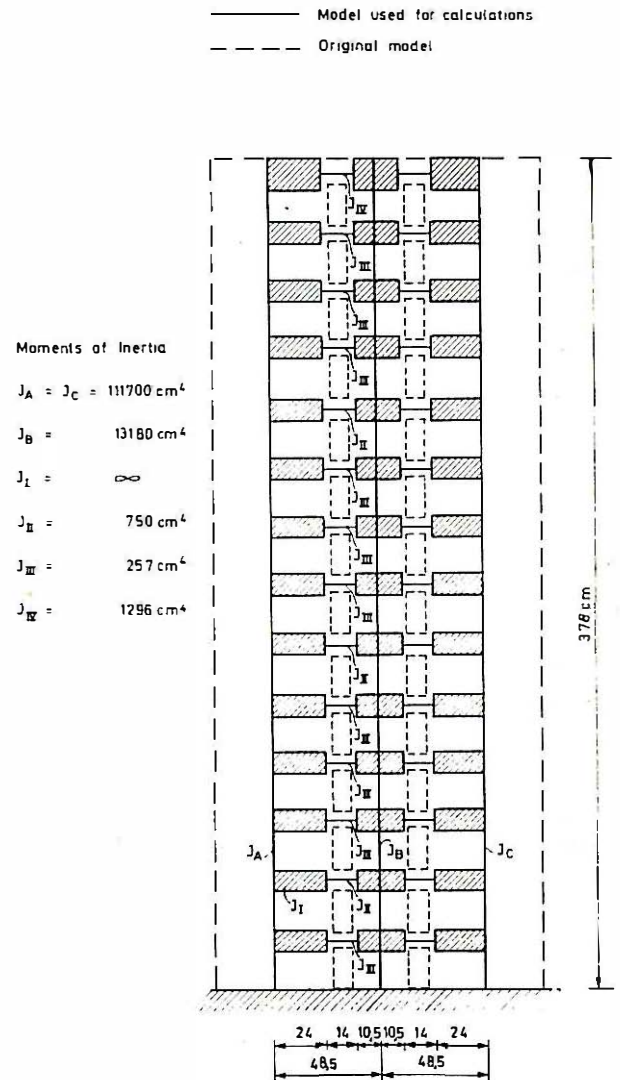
Model used for calculating the shear wall with opening as a frame.
